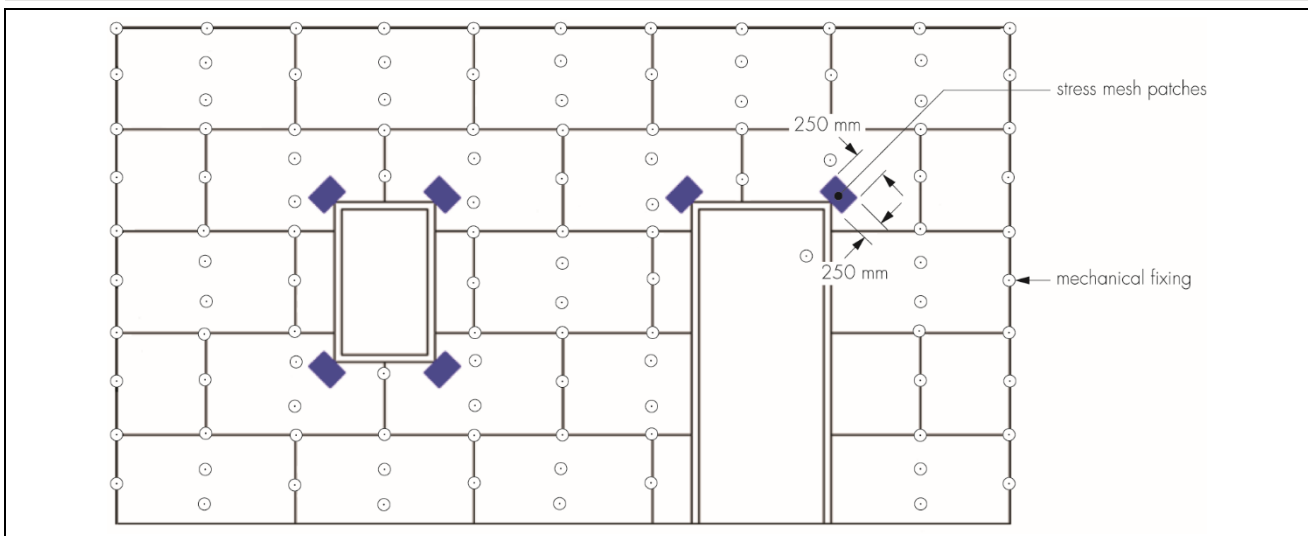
Mechanical fixing pattern and additional reinforcement around openings
